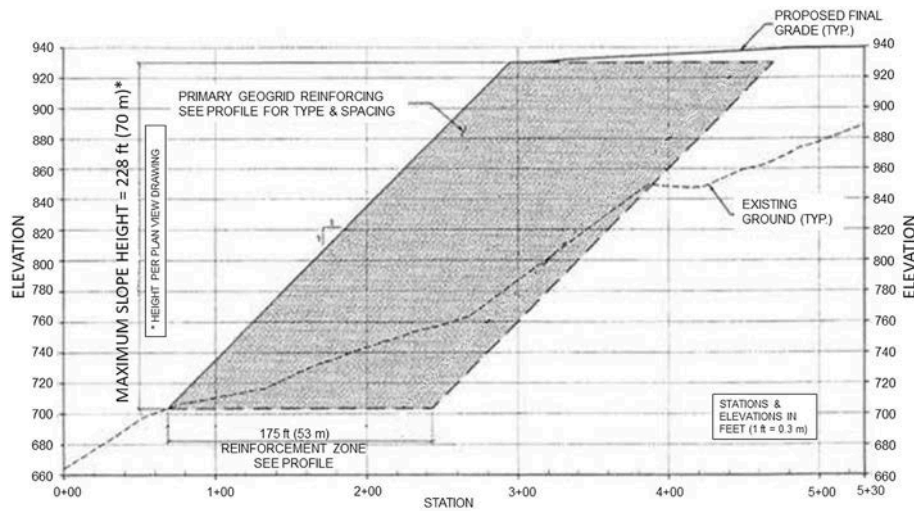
Construction plan cross section, at maximum height (after Triad Engineering, 2005).
